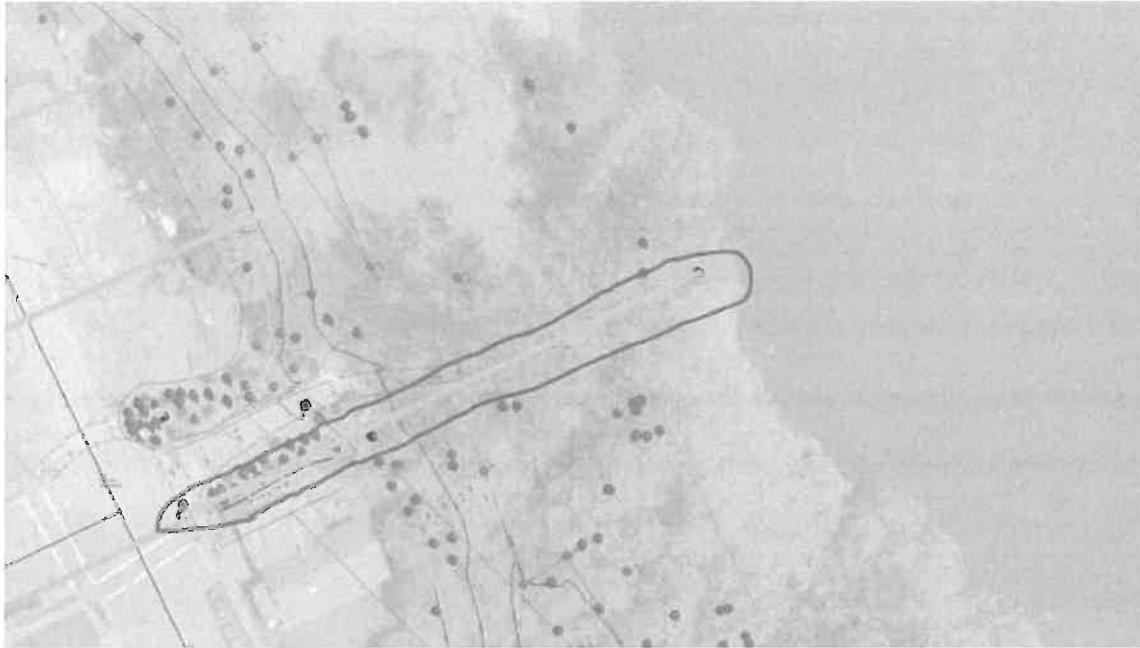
King Street Stormwater Outfall Pipe (circled red)
